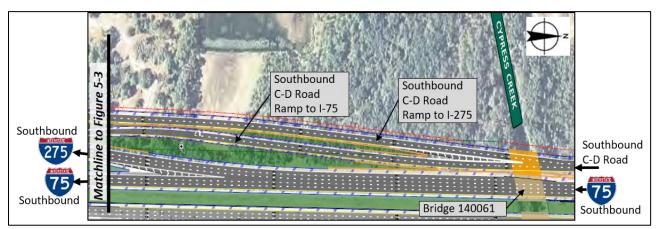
Alternative 1-Diverge Points for C-D Road & I-75/I-275
